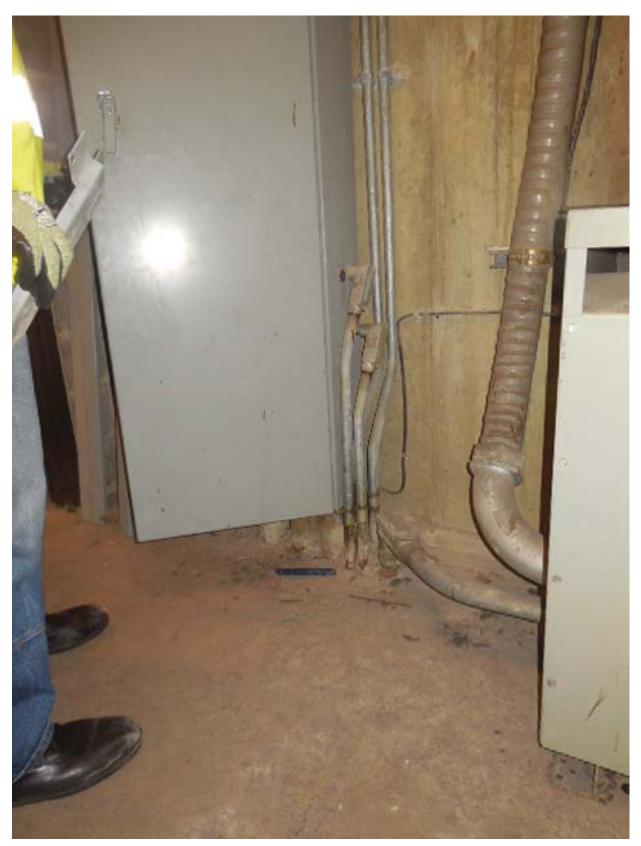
E03 U Street West – Intermediate manhole in mezzanine
